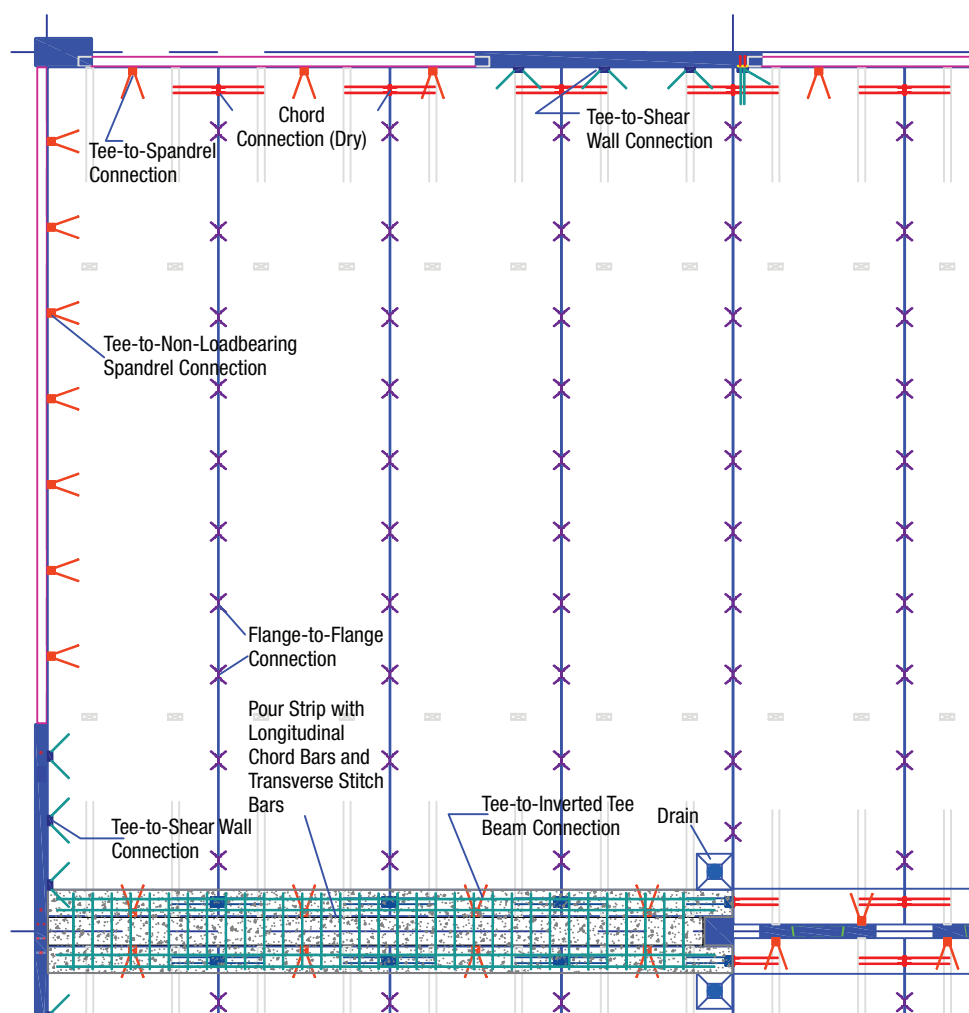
Garage bay with Typical Connections Identified for Pretopped Construction
